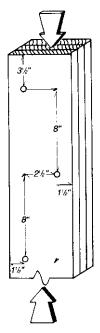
C Typical Nailing Schedules for Built-Up Columns
